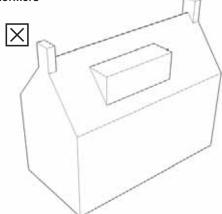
large flat roofed single dormer out of scale with the original dwelling
